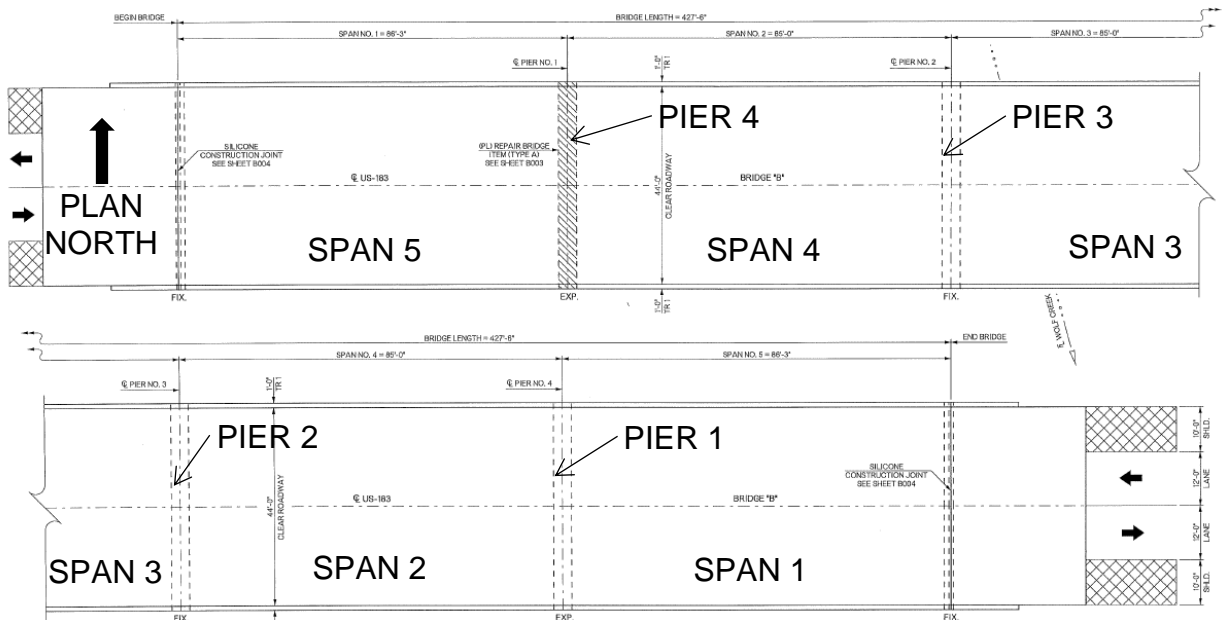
Plan view of U.S. 183/412 over Wolf Creek bridge
